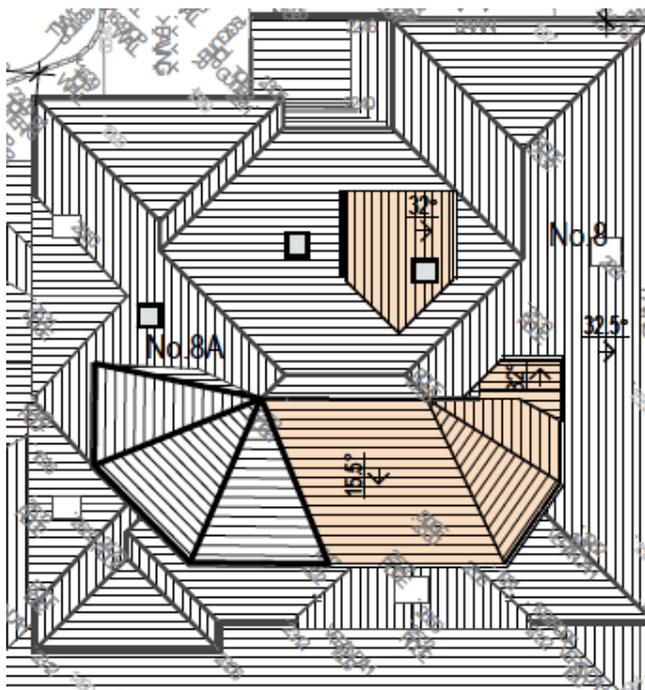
extract of the plans showing the proposed roof form in relation to the existing.
